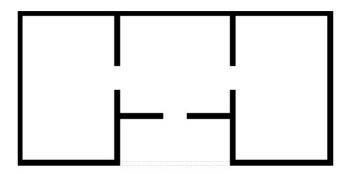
Inner hall plan type in Cyprus traditional houses (Dinçyürek, 2002)
